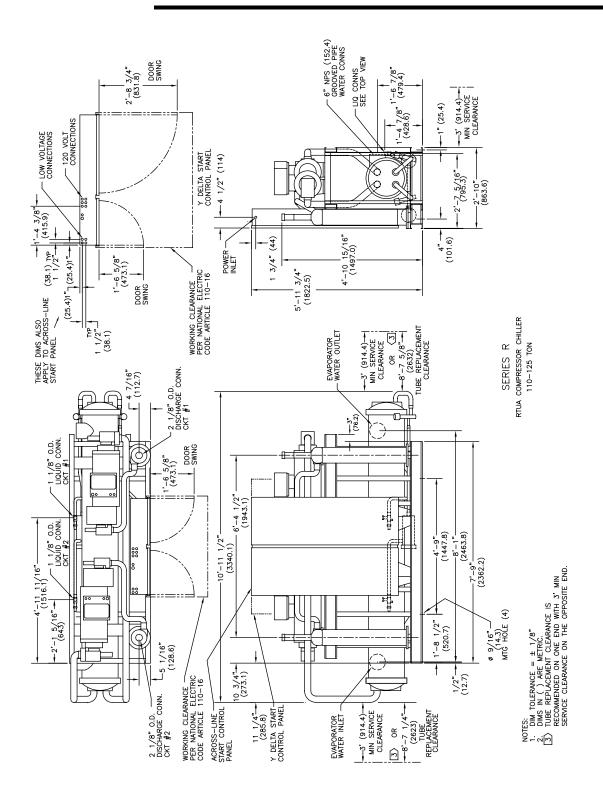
Dimension and Clearances for RTUA Compressor Chiller – 100-125 Tons
